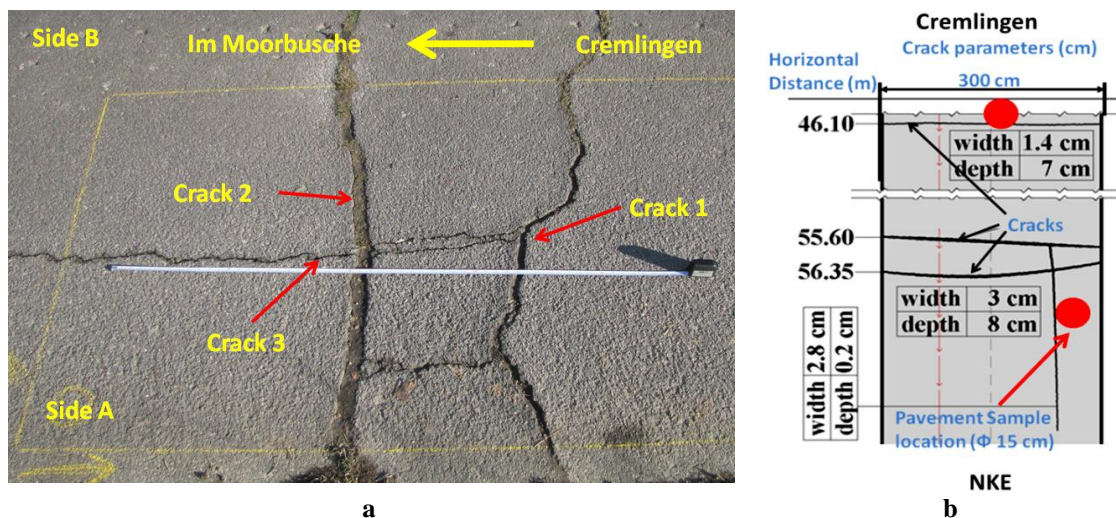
The cracks on Section C, (a) location and dimensions of cracks (red arrow indicating direction of survey) and, (b) the crack and core location on 46 m of Section C
